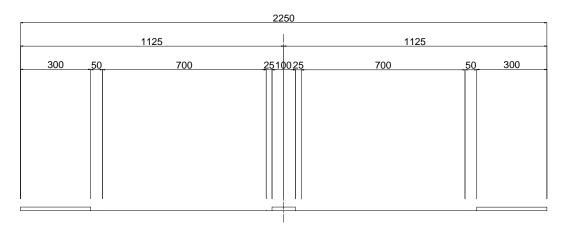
Typical Cross Section of Makerere Hill Road
